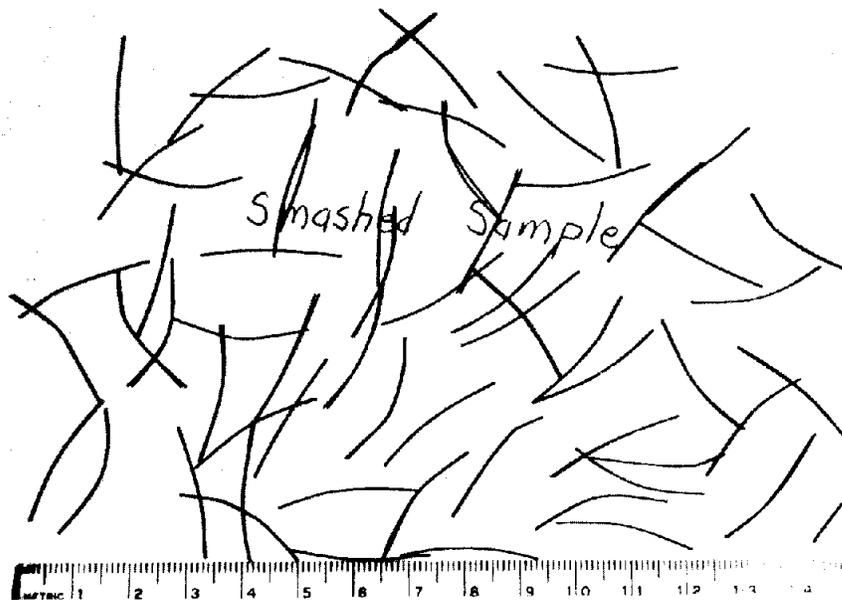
TYPICAL NS FIBERS FROM PULVERIZED SAMPLES OF HARDENED SHOTCRETE
